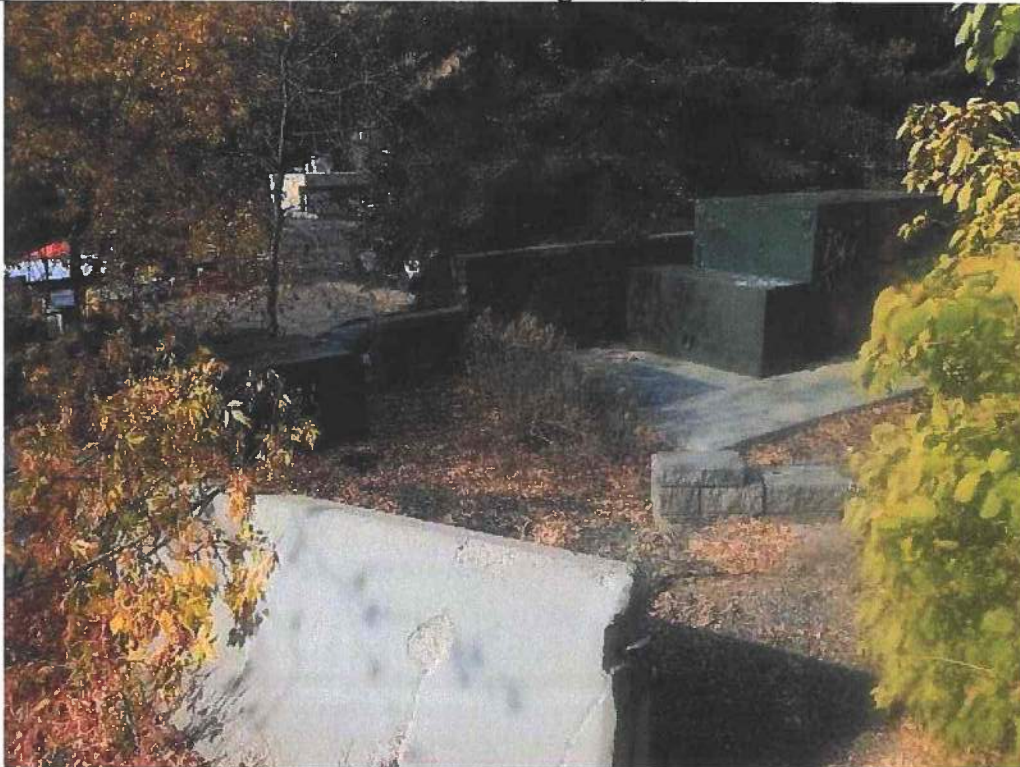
Nearest electric transformers within concrete walled area NE of subject property
